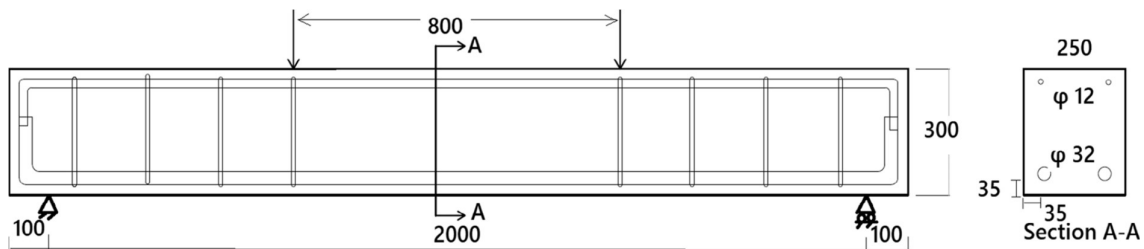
Detailing of bending specimen for crack spacing (Naotunna, Samarakoon and Fosså, 2020)
